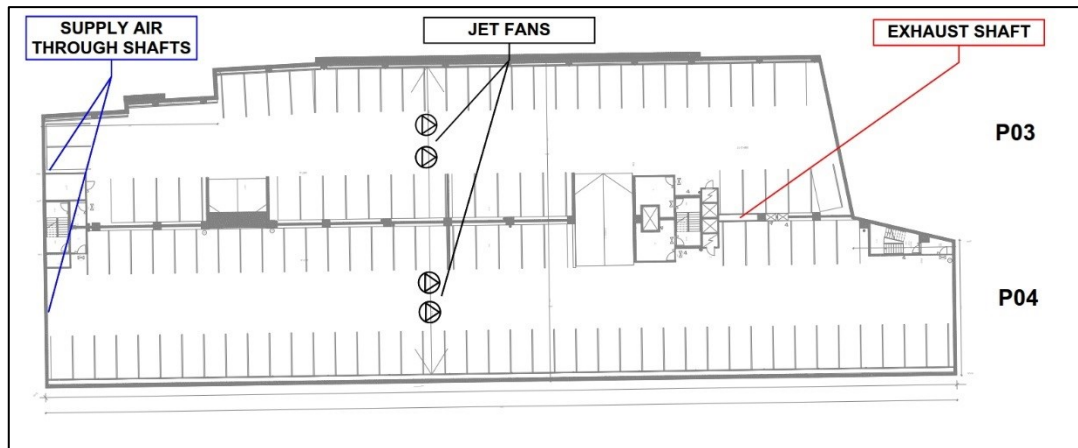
Floor plan and ventilation configuration for decks P03, P04
